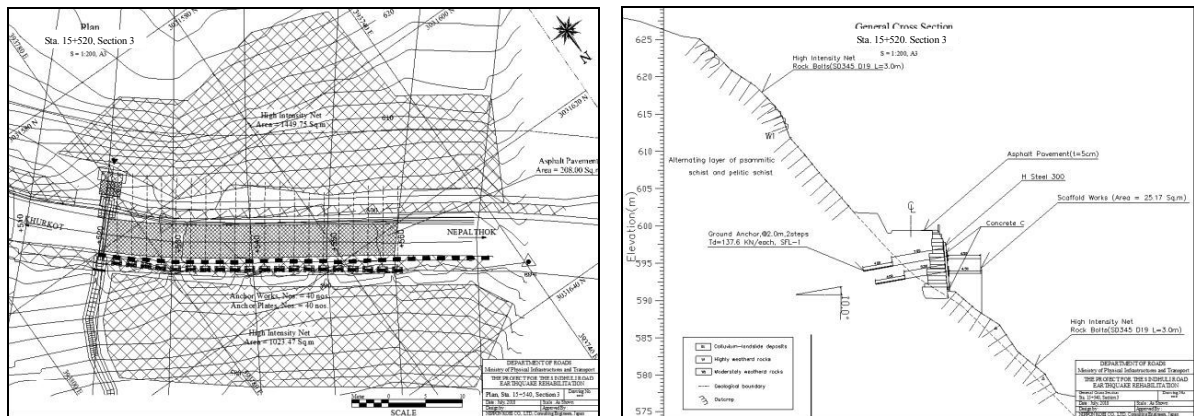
General Plan and Cross Section of the Proposed Countermeasures (Sta. 15+520)
